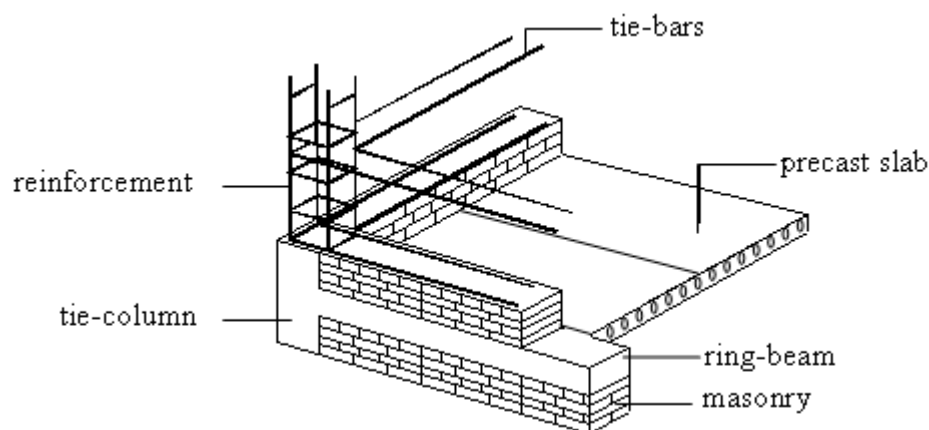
A Typical Construction Detail of Confined Masonry Structures
